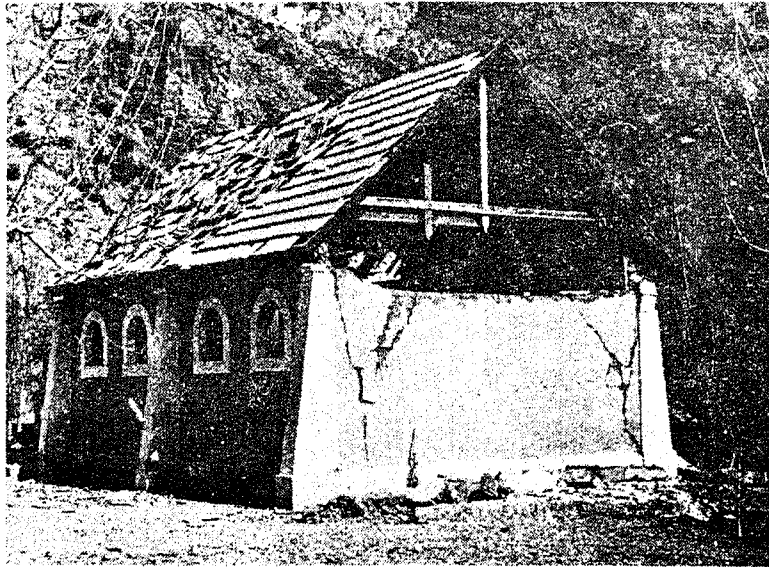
Queltehues Church. Shows collapsed end wall and cracks caused by movement normal to the wall.
